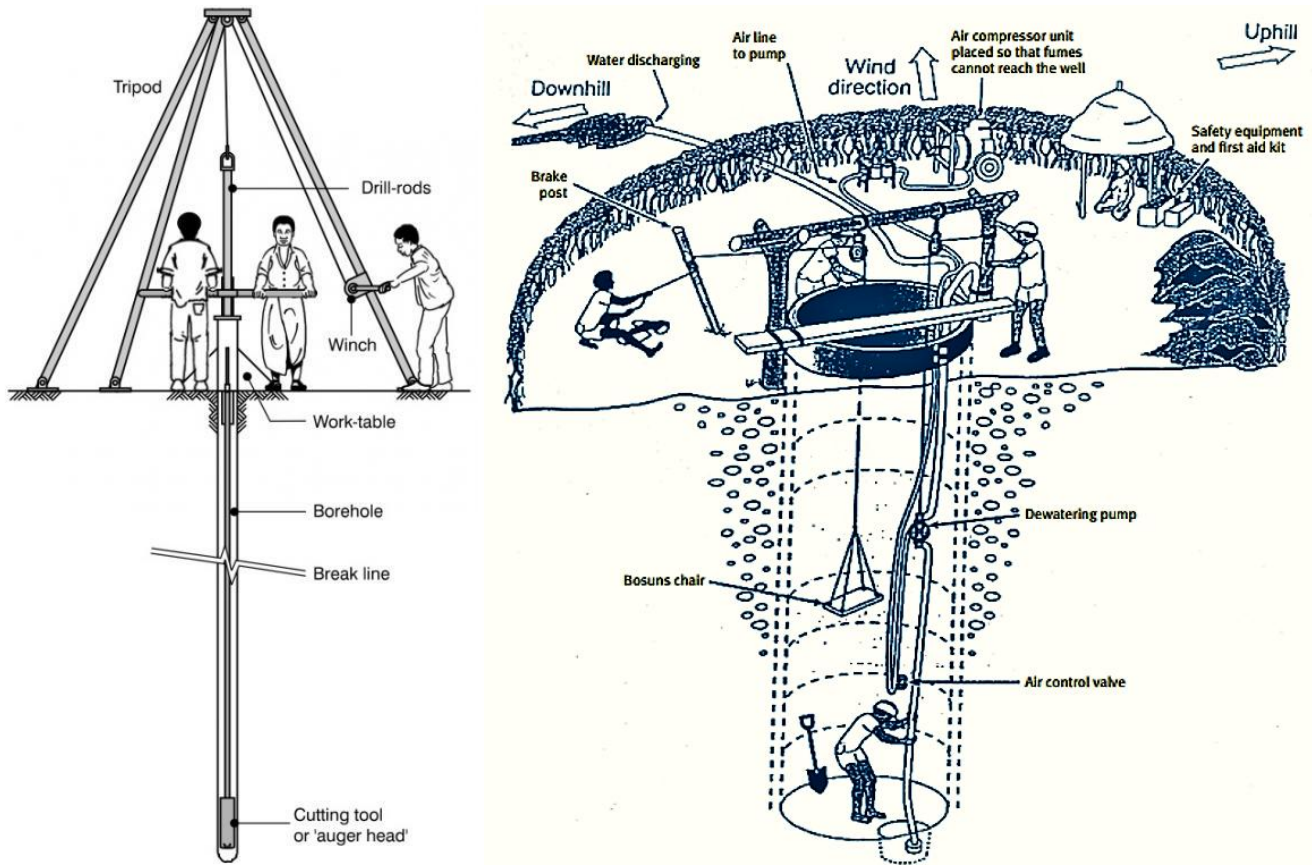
Cross-section of an augered well under construction showing derrick, torque handles, and cutting head on the left (Seencon International GmbH, 2020a) and hand dug well under construction showing ingress/egress, ventilation, and water bailing mechanisms (Seecon Internatioinal GmbH, 2020b).
